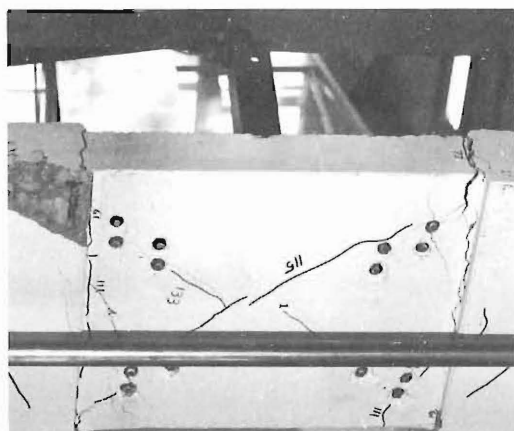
to 7.25 show the crack patterns of the beams and walls at various stages of cyclic loading. The maximum load during the first two elastic cycles was less than the load required to crack the model. The first cracks were observed at the tension corners in the second floor coupling beam at a load of $0.15 P_u^*$ during cycle 3
